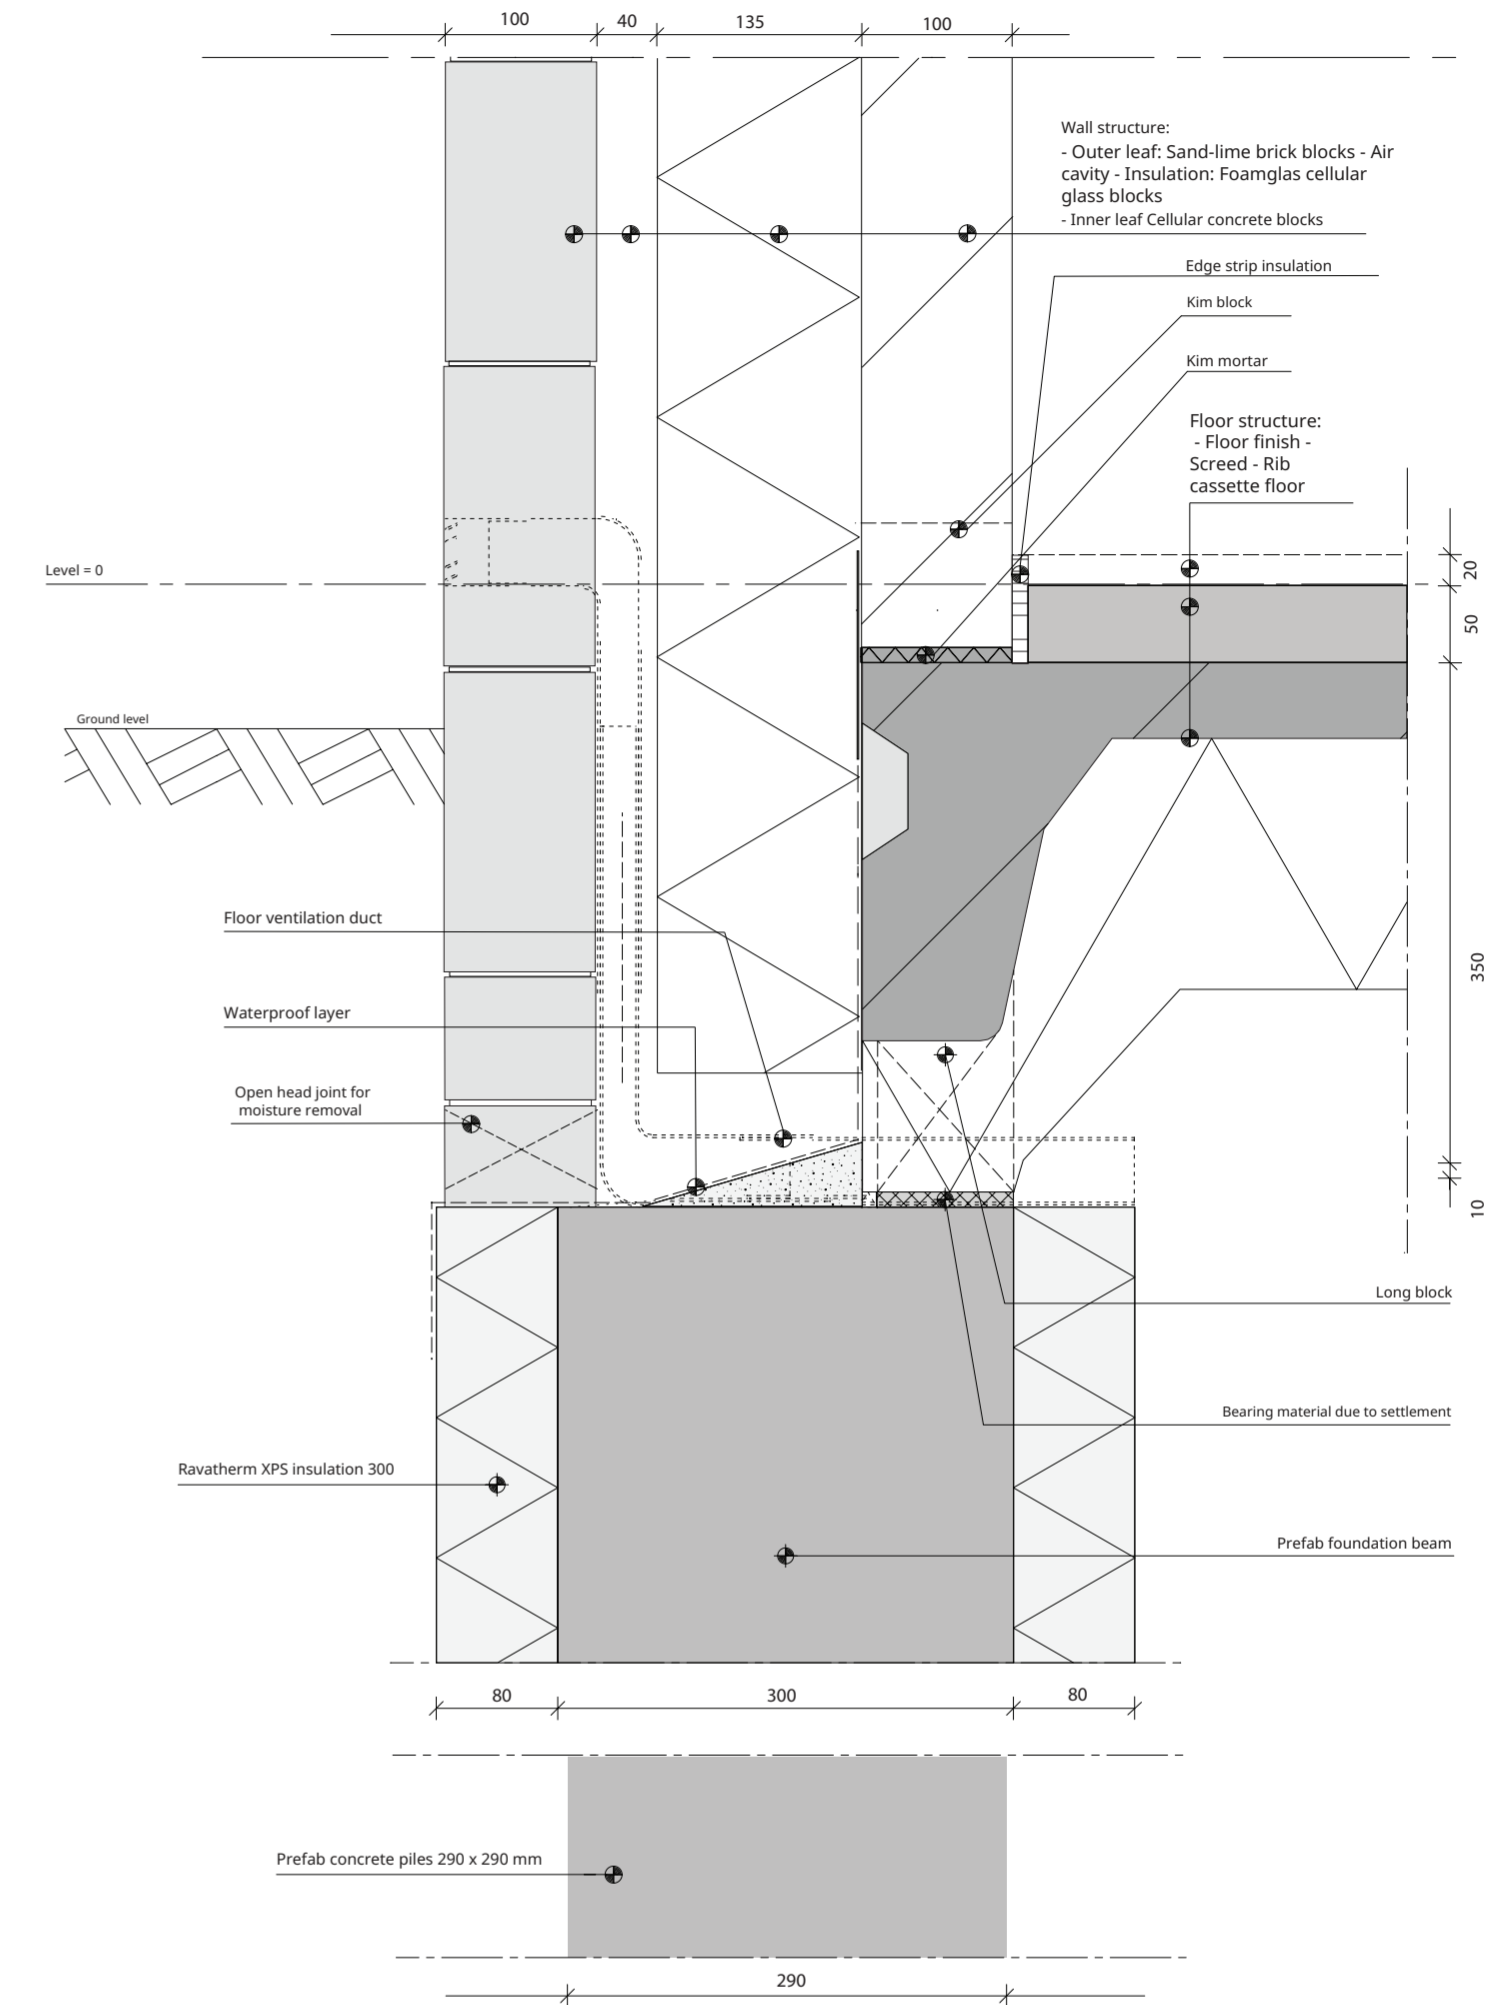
Detail-Alternative 4: Bottom of frame, ground floor, foundation
